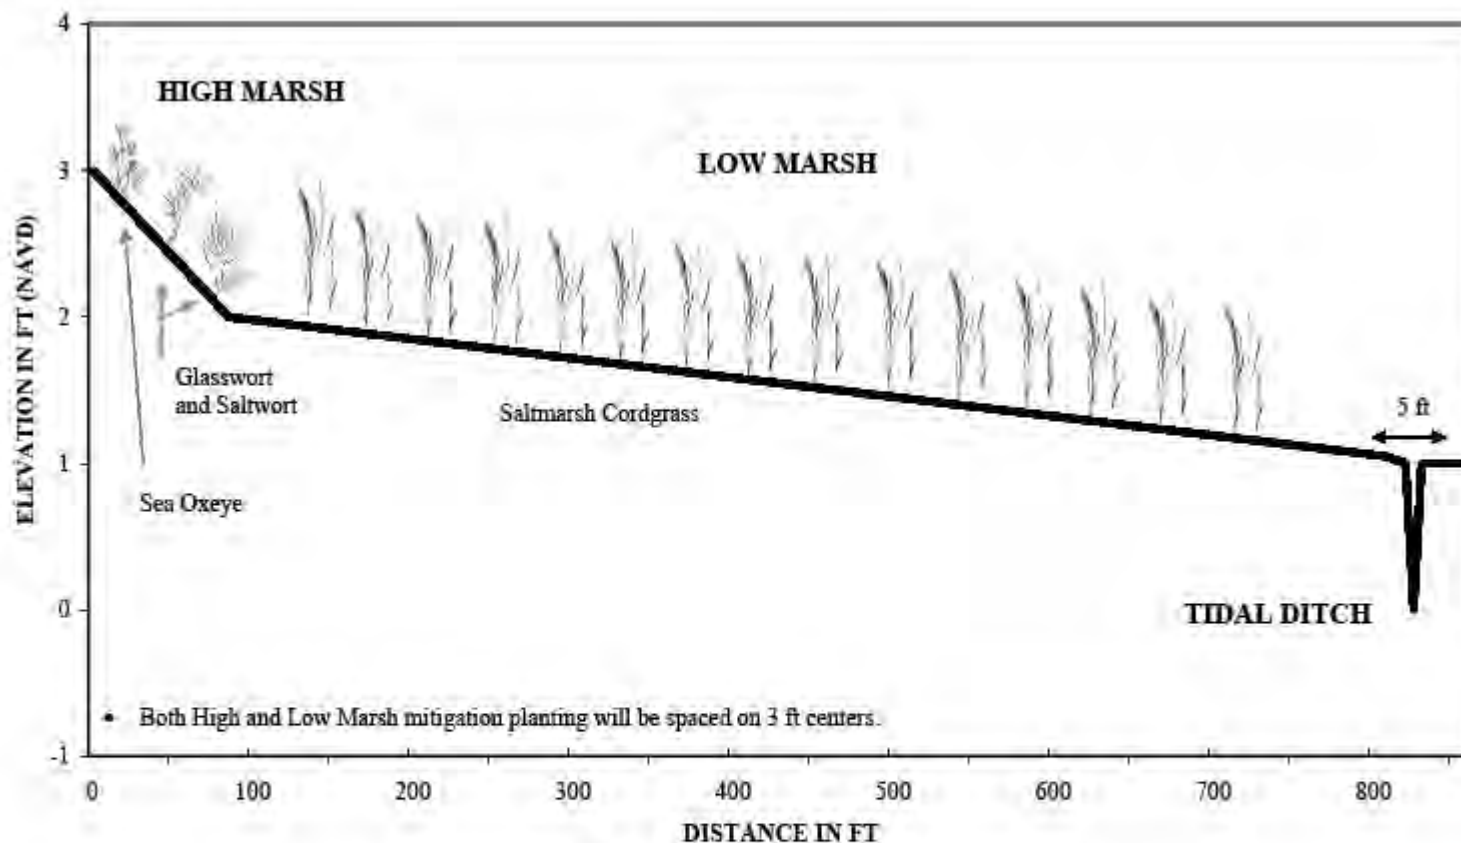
PLANTING DETAIL TYPICAL PROFILE
